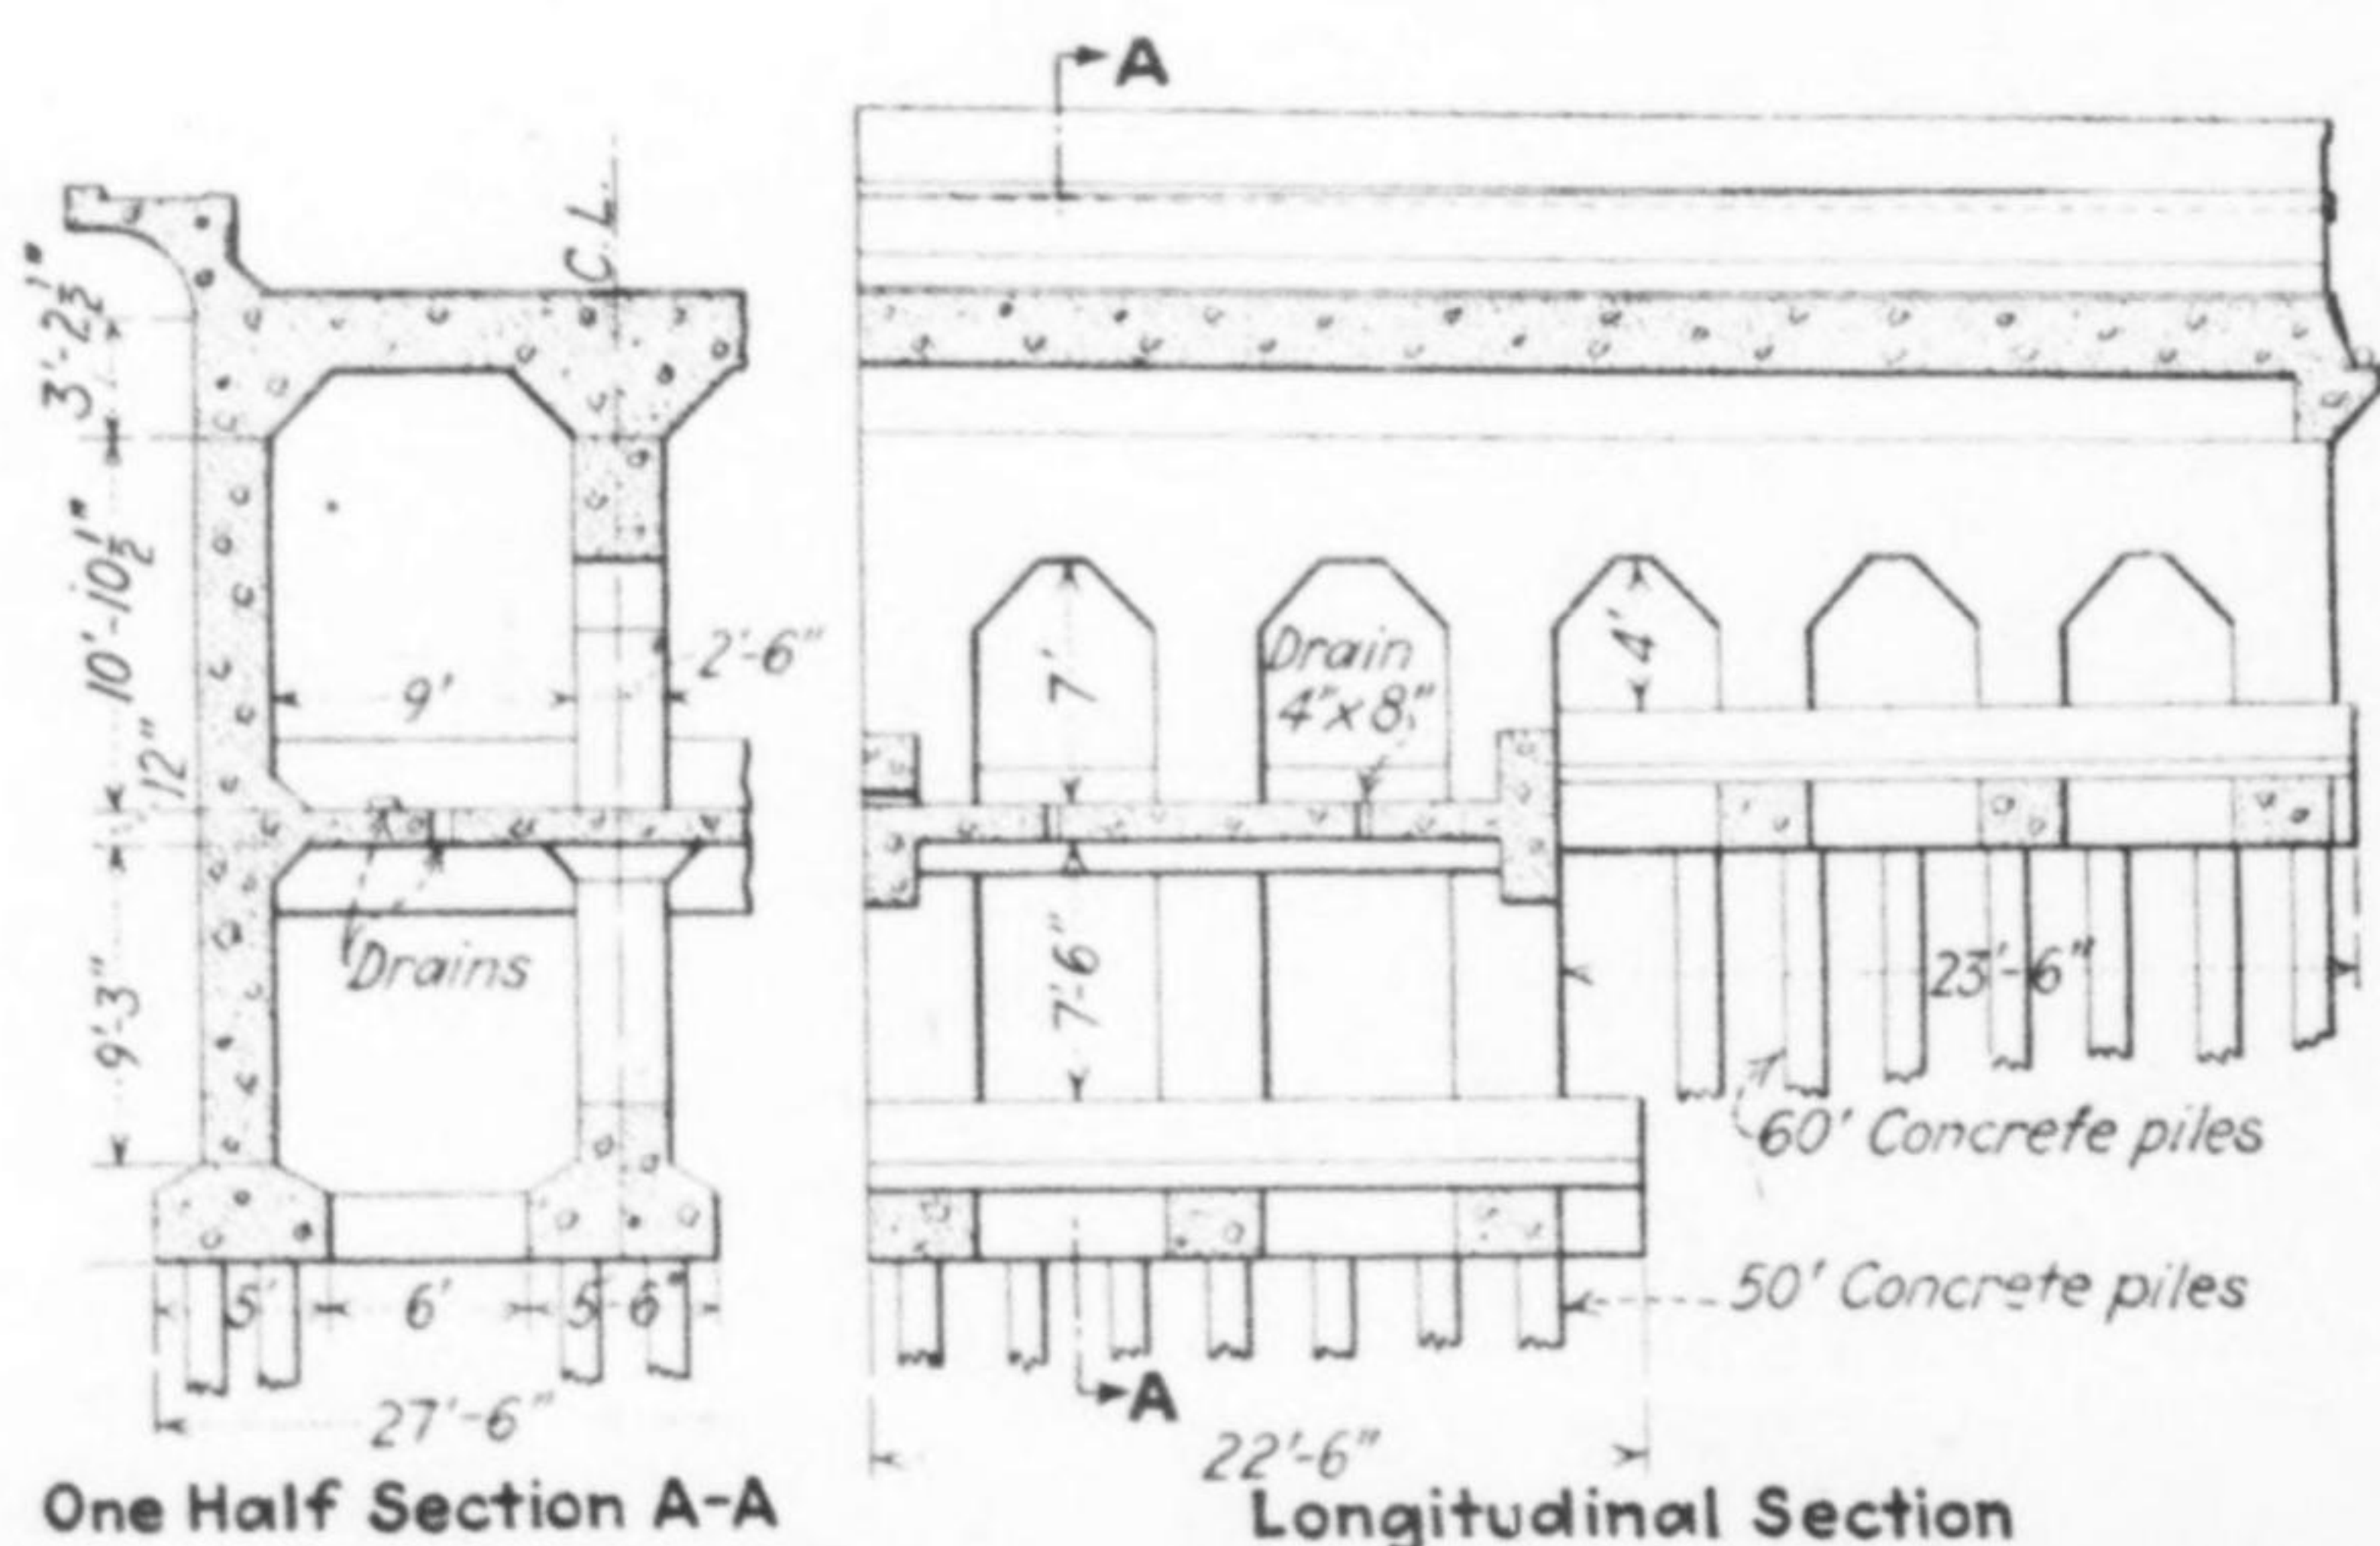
CONCRETE APPROACH FOR EAST PIER
